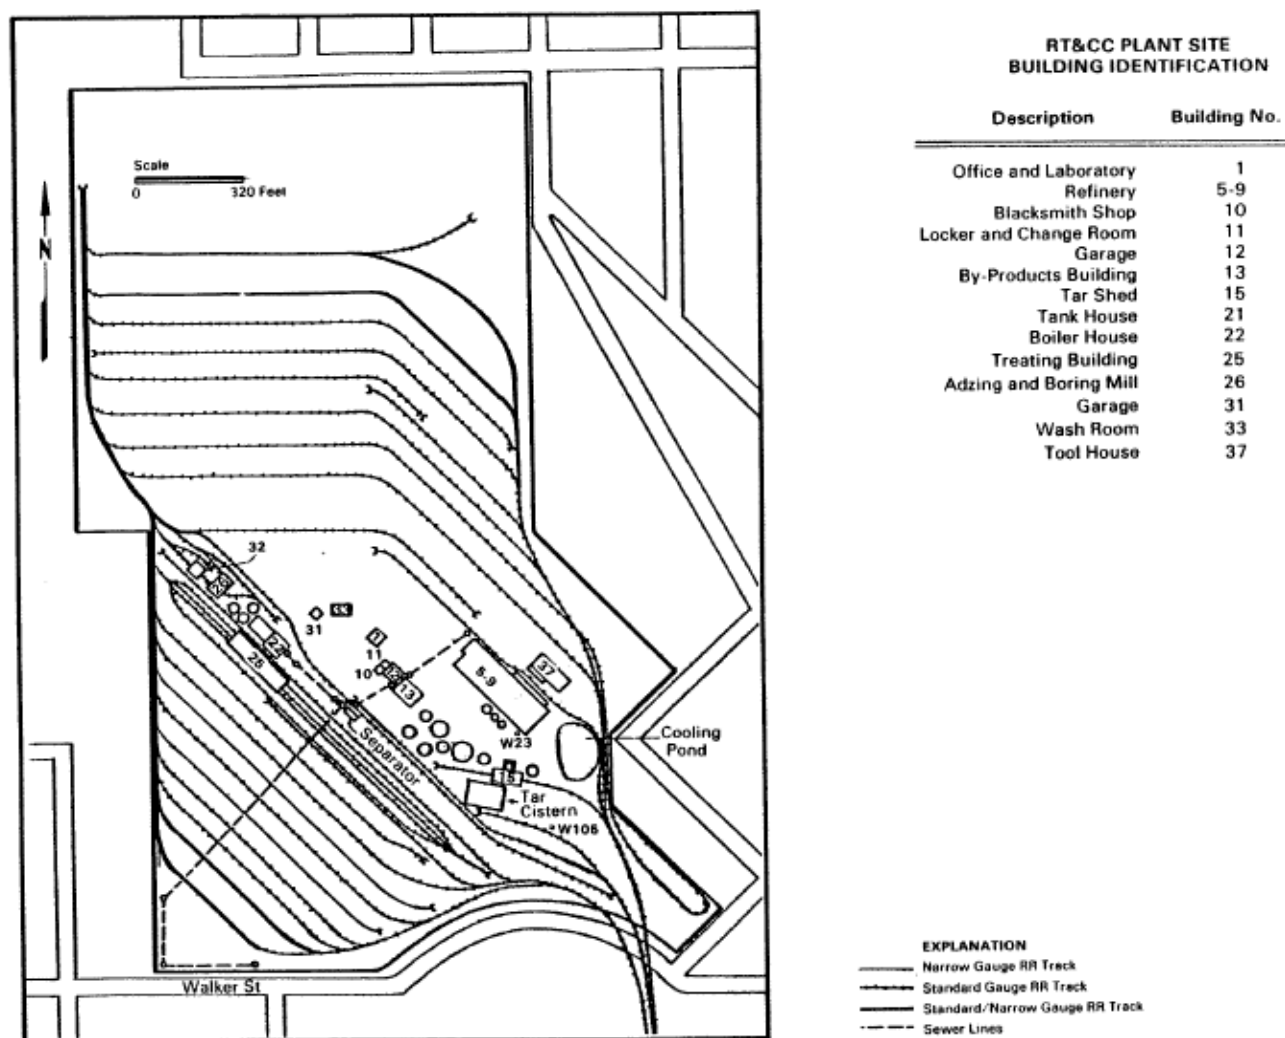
Plant Site Drawing From 1944 Blueprint
